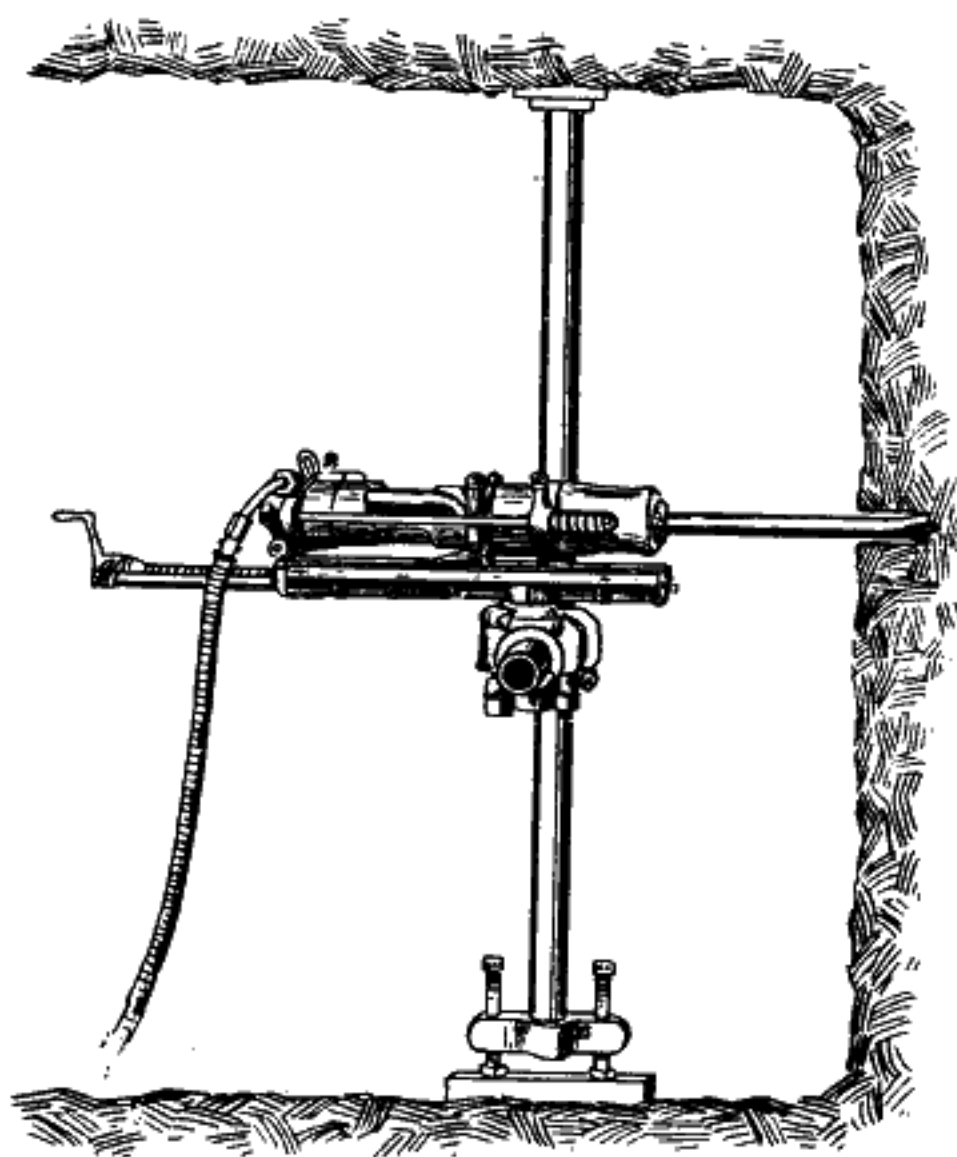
A column or post drill for work in a tunnel heading in hard rock.
